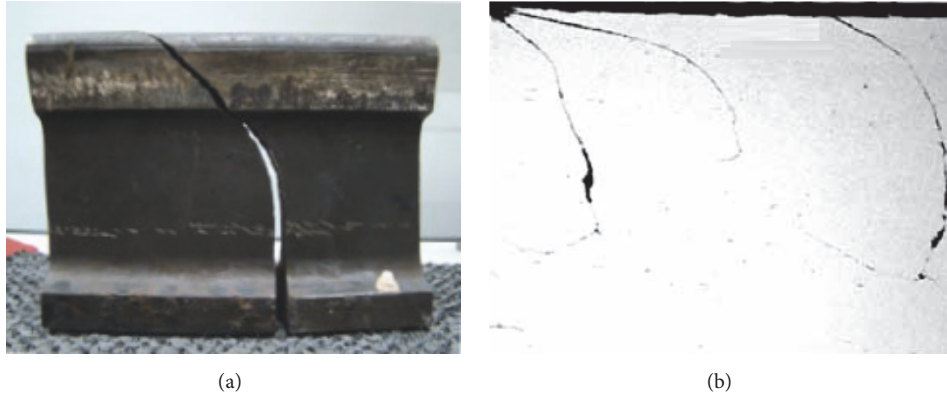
Growth path of the rolling contact fatigue cracks: (a) fracture and (b) spalling on the rail surface.
